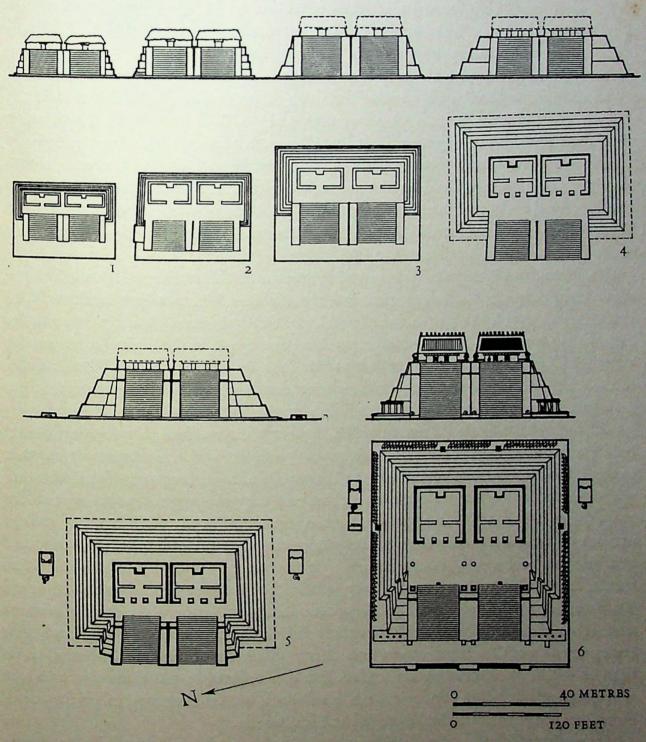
Tenayuca, pyramid. Plans and elevations showing enlargements of c. 1300-1500
